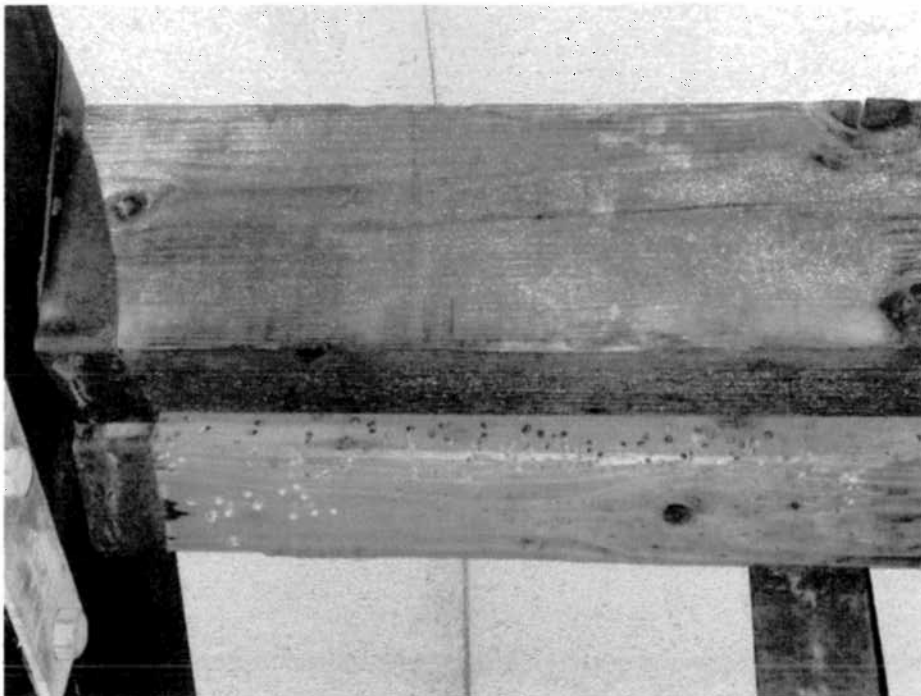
Insect damage to 4 x 8 roof purlin.
